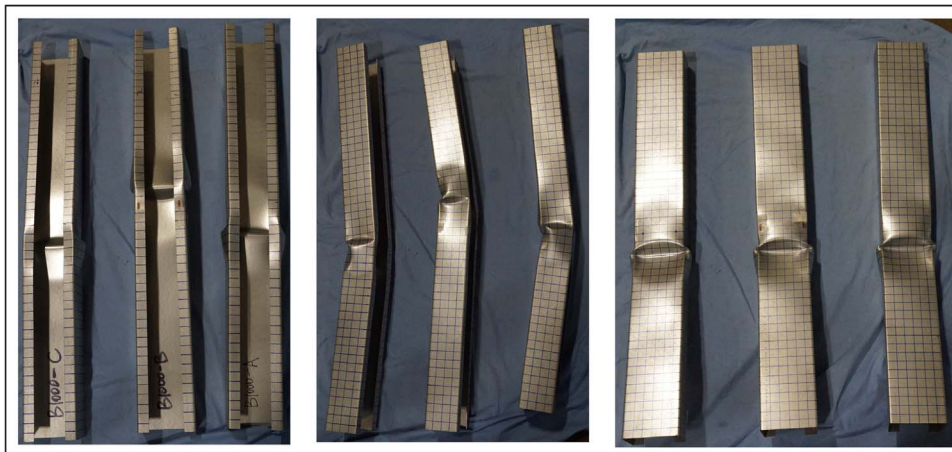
Failure modes of 1 m long columns with type B cross-section.
